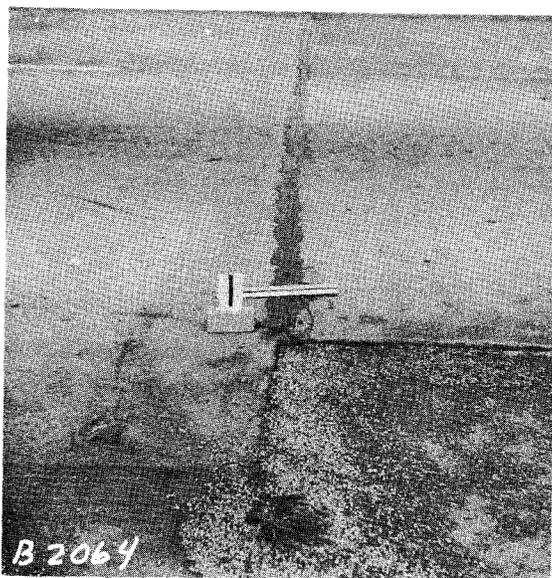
Closed expansion joint between pavement and bridge approach slab. Joint was $1\frac{1}{2}$ inches wide at time of construction.
